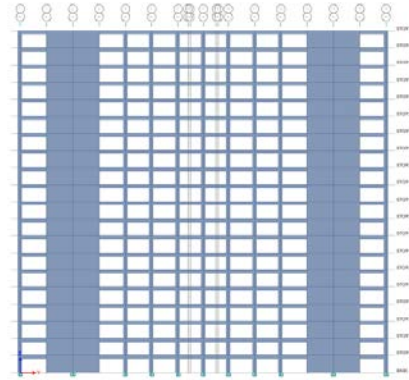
Typical dual (frame with shear walls) 20 story structure
